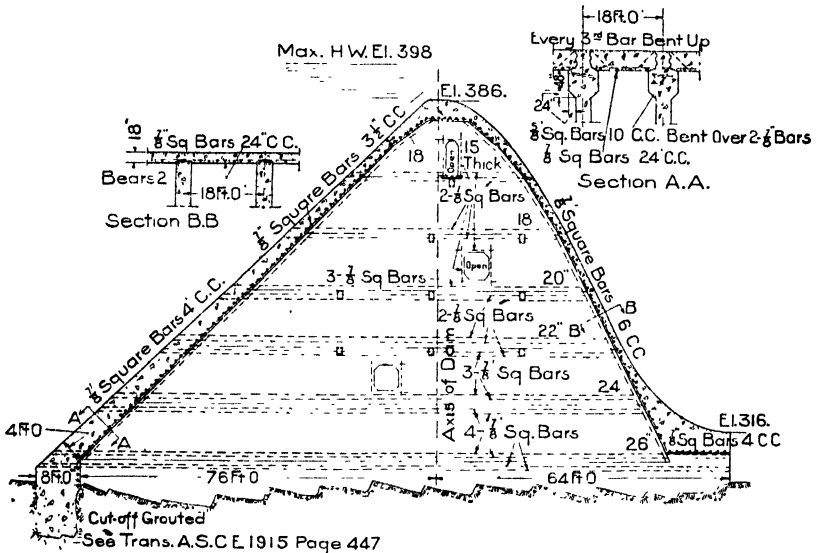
Section through Reinforced Concrete Dam at Estacada, Oregon. •
